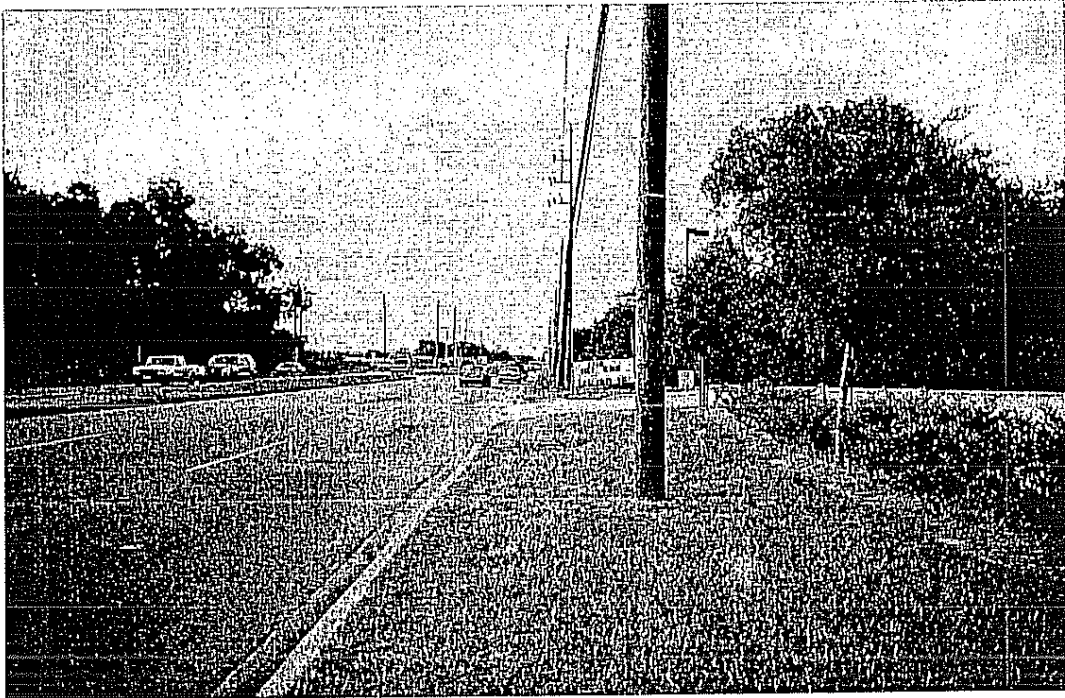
Facing south towards FM 1960, also from the Slick Willies Family Pool Hall parking lot.
